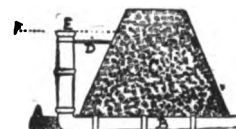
Section of outlet for fish pond. *a* pond bottom; *b* sewer pipe; *c* dike; *d* support for stand pipe (*e*); *f* water level.
